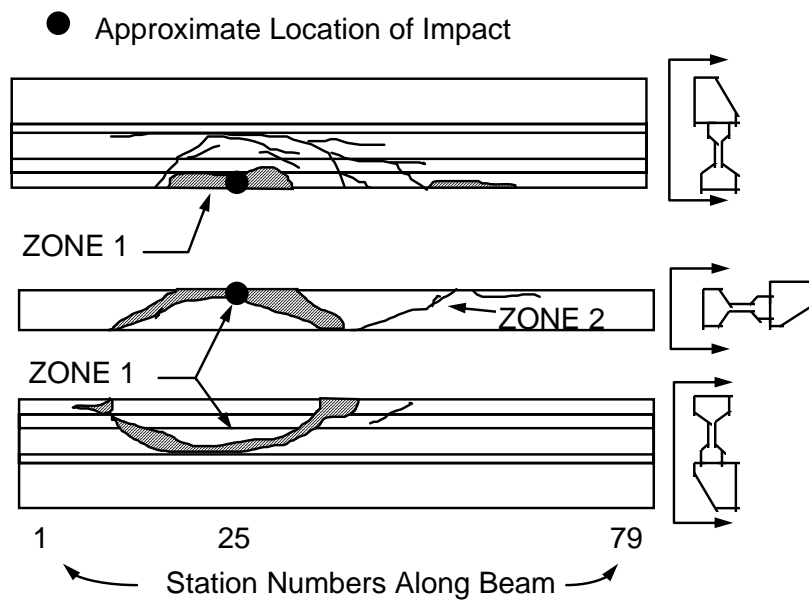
Schematic of impact damage of Steck Girder
